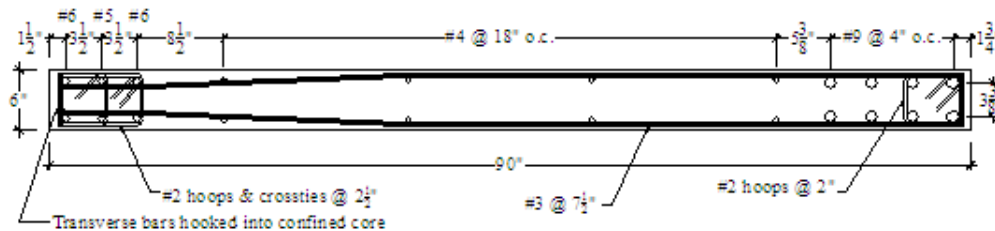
Cross-sectional dimensions and reinforcement details of cast-in-place concrete wall RWN (1 in. = 25.4 mm).
